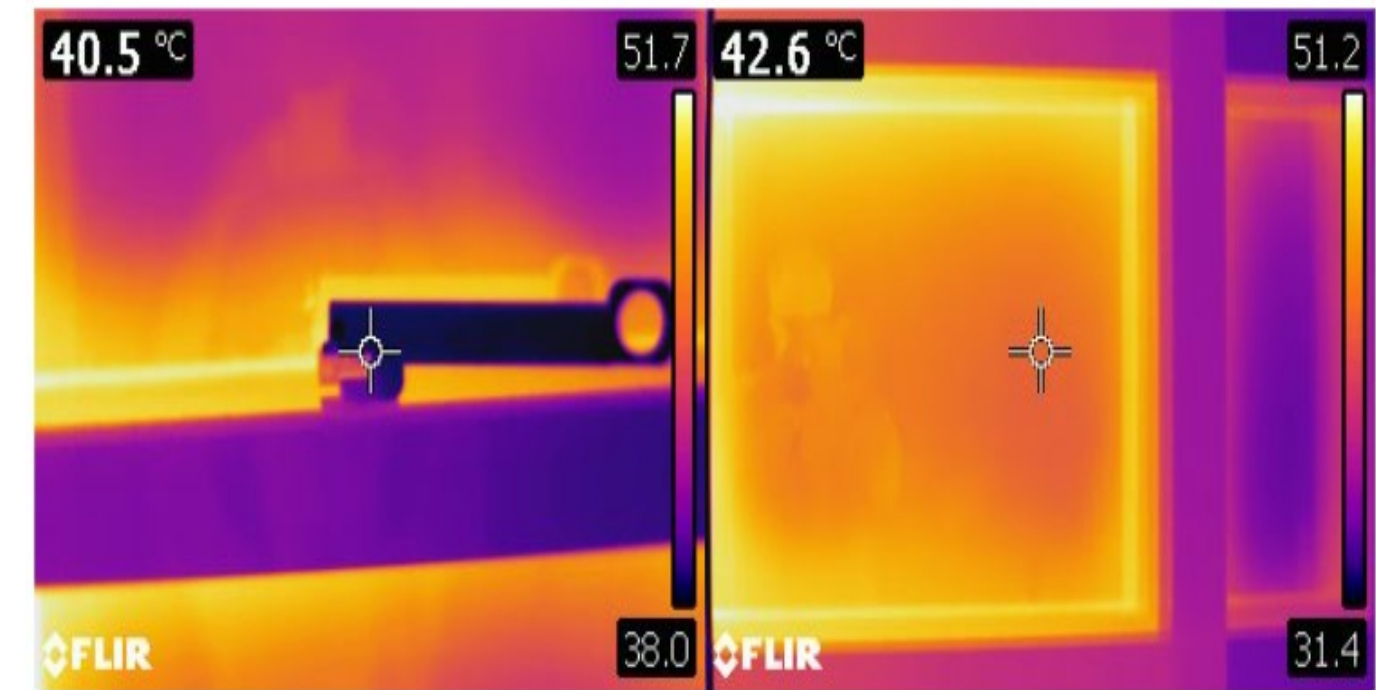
IR Images capturing windows and facade of EB2 building showing no sign of thermal leakage.
